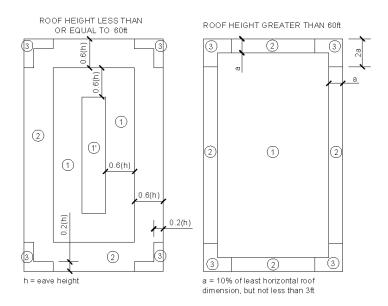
ASCE 7-16 Roof Zones for Low-Slope Roofs ∂≤7°
